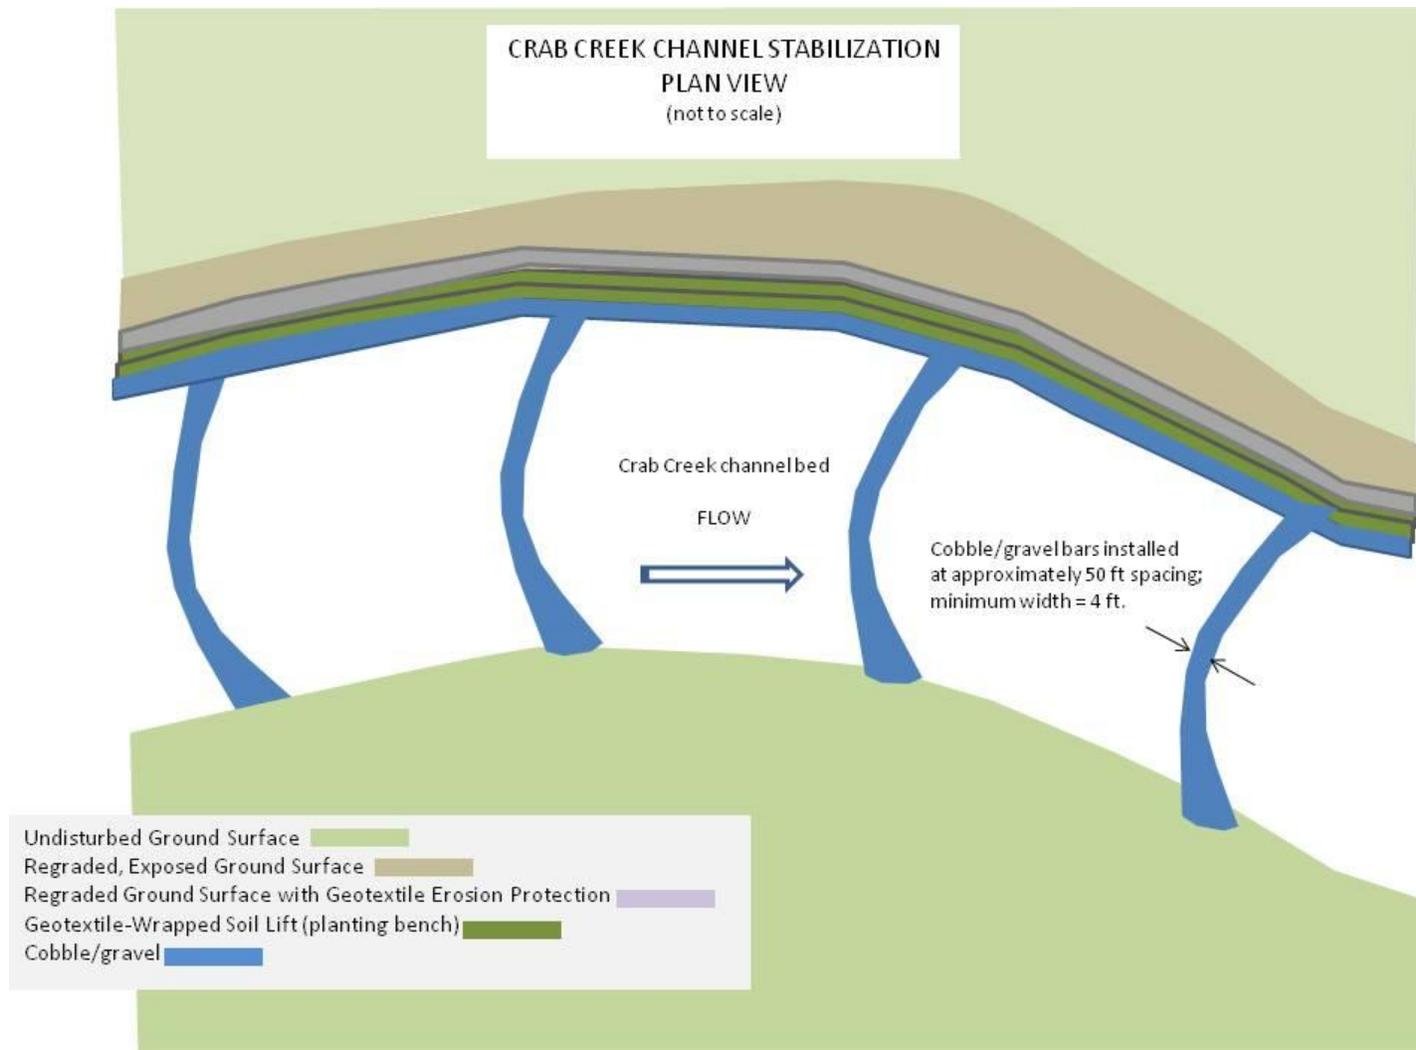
Middle Crab Creek Channel Stabilization, Plan View.
